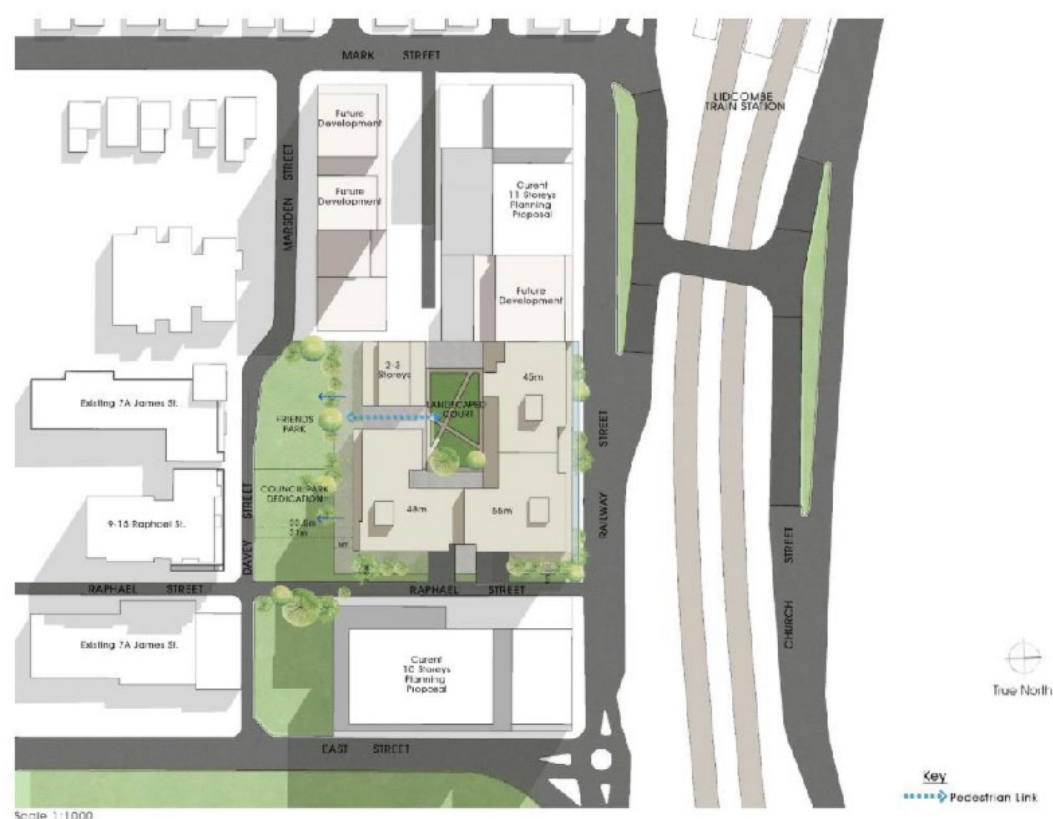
Site Plan - 4-12 Railway Street, Lidcombe – Massing Study for Planning Proposal, prepared by Architecture and Building Works
